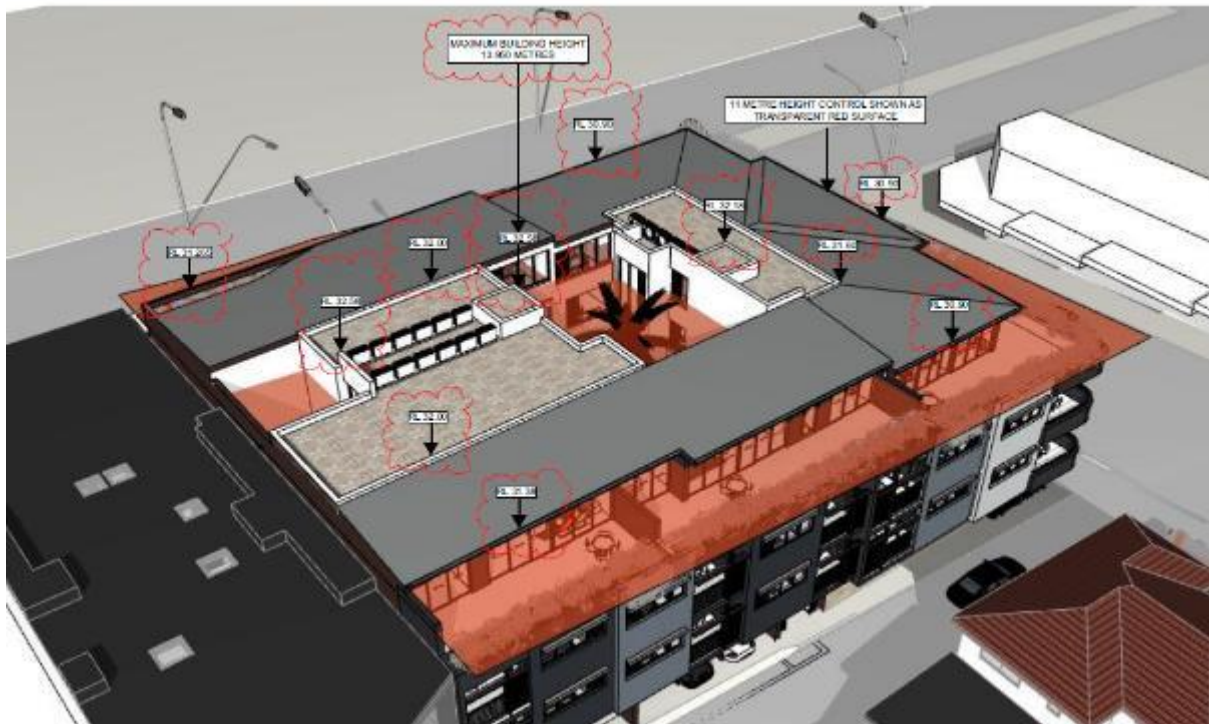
Plan extract DA040(E) showing the building height breaching elements proposed above the 11 metre building height standard
